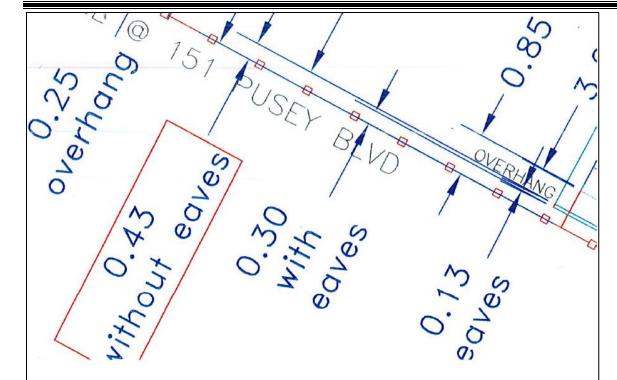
Detailed Site Plan Showing Side Yard Setback and Eaves Encroachment
